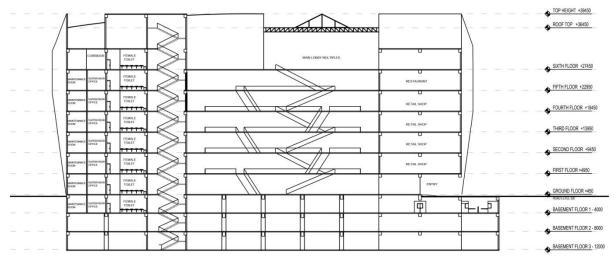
Floor Plans for Shopping Mall Source: Made by Ghafir Abbas
